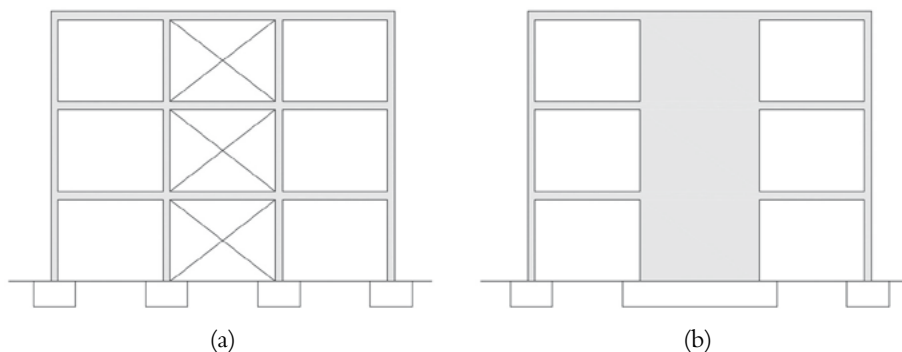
Stiffening systems: (a) Bracing systems; (b) Shear walls.
